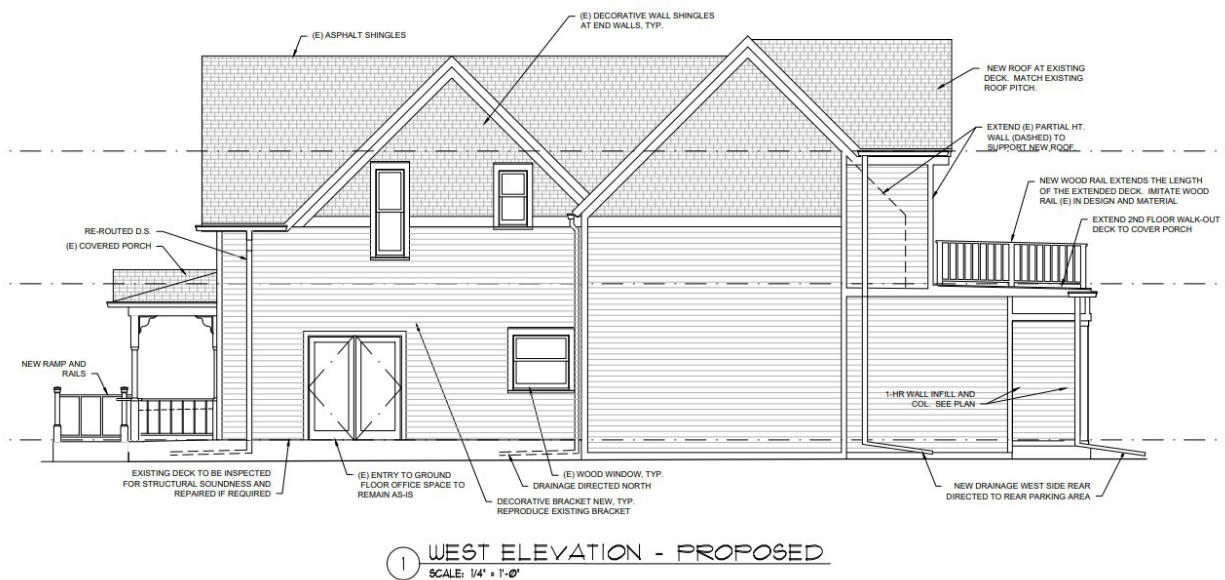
Proposed designs on west elevation highlighted, 2506 W. Alamo Ave.
